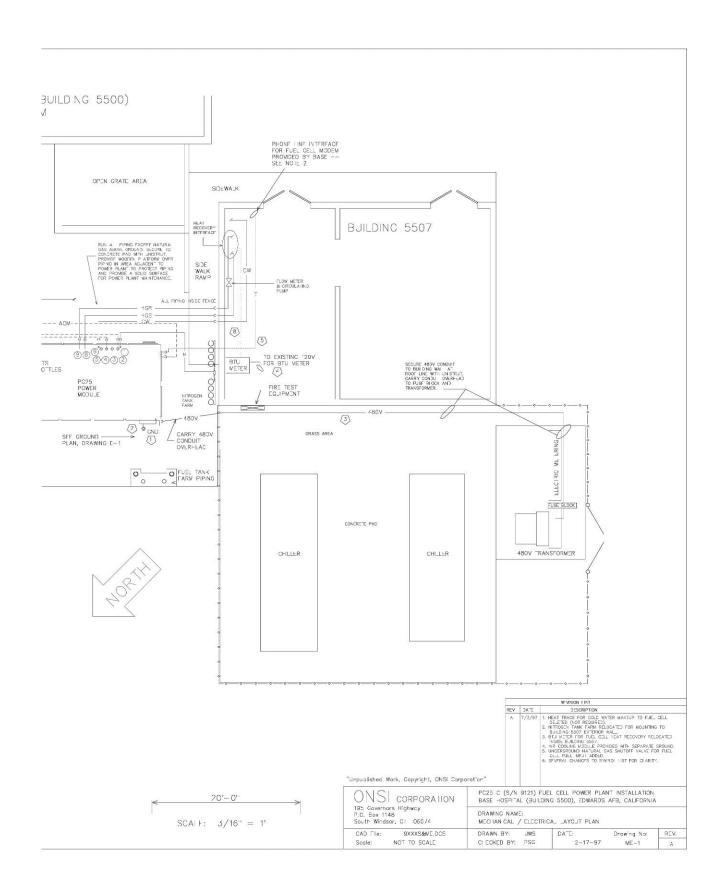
Final installation drawings – mechanical / electrical layout plan.
